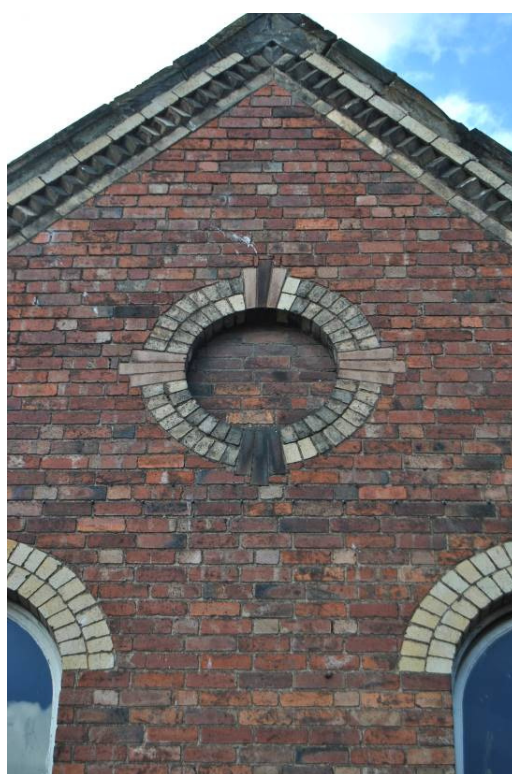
Building I, detail of 'oculus' window and decorative gable treatment.
